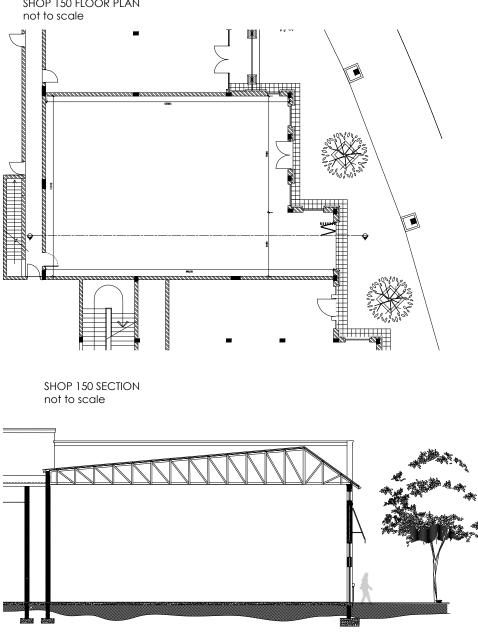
Shop 150 Floor plan and Section (Author, 2016).
